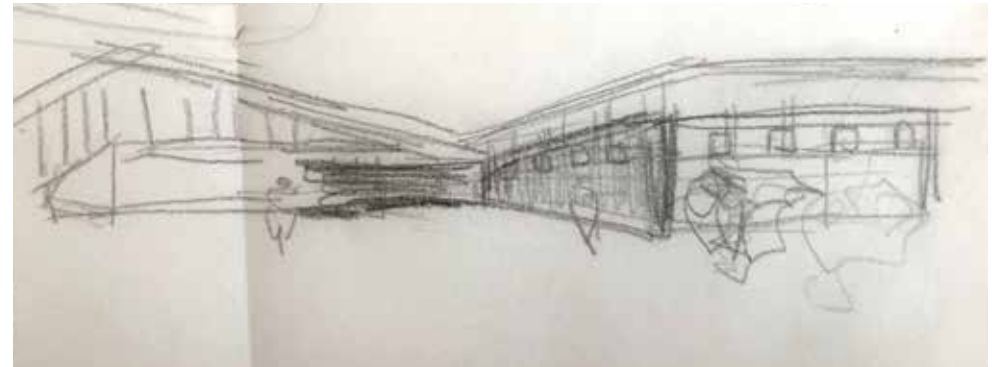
Ground floor: Fort proposal (Author, 2020)
